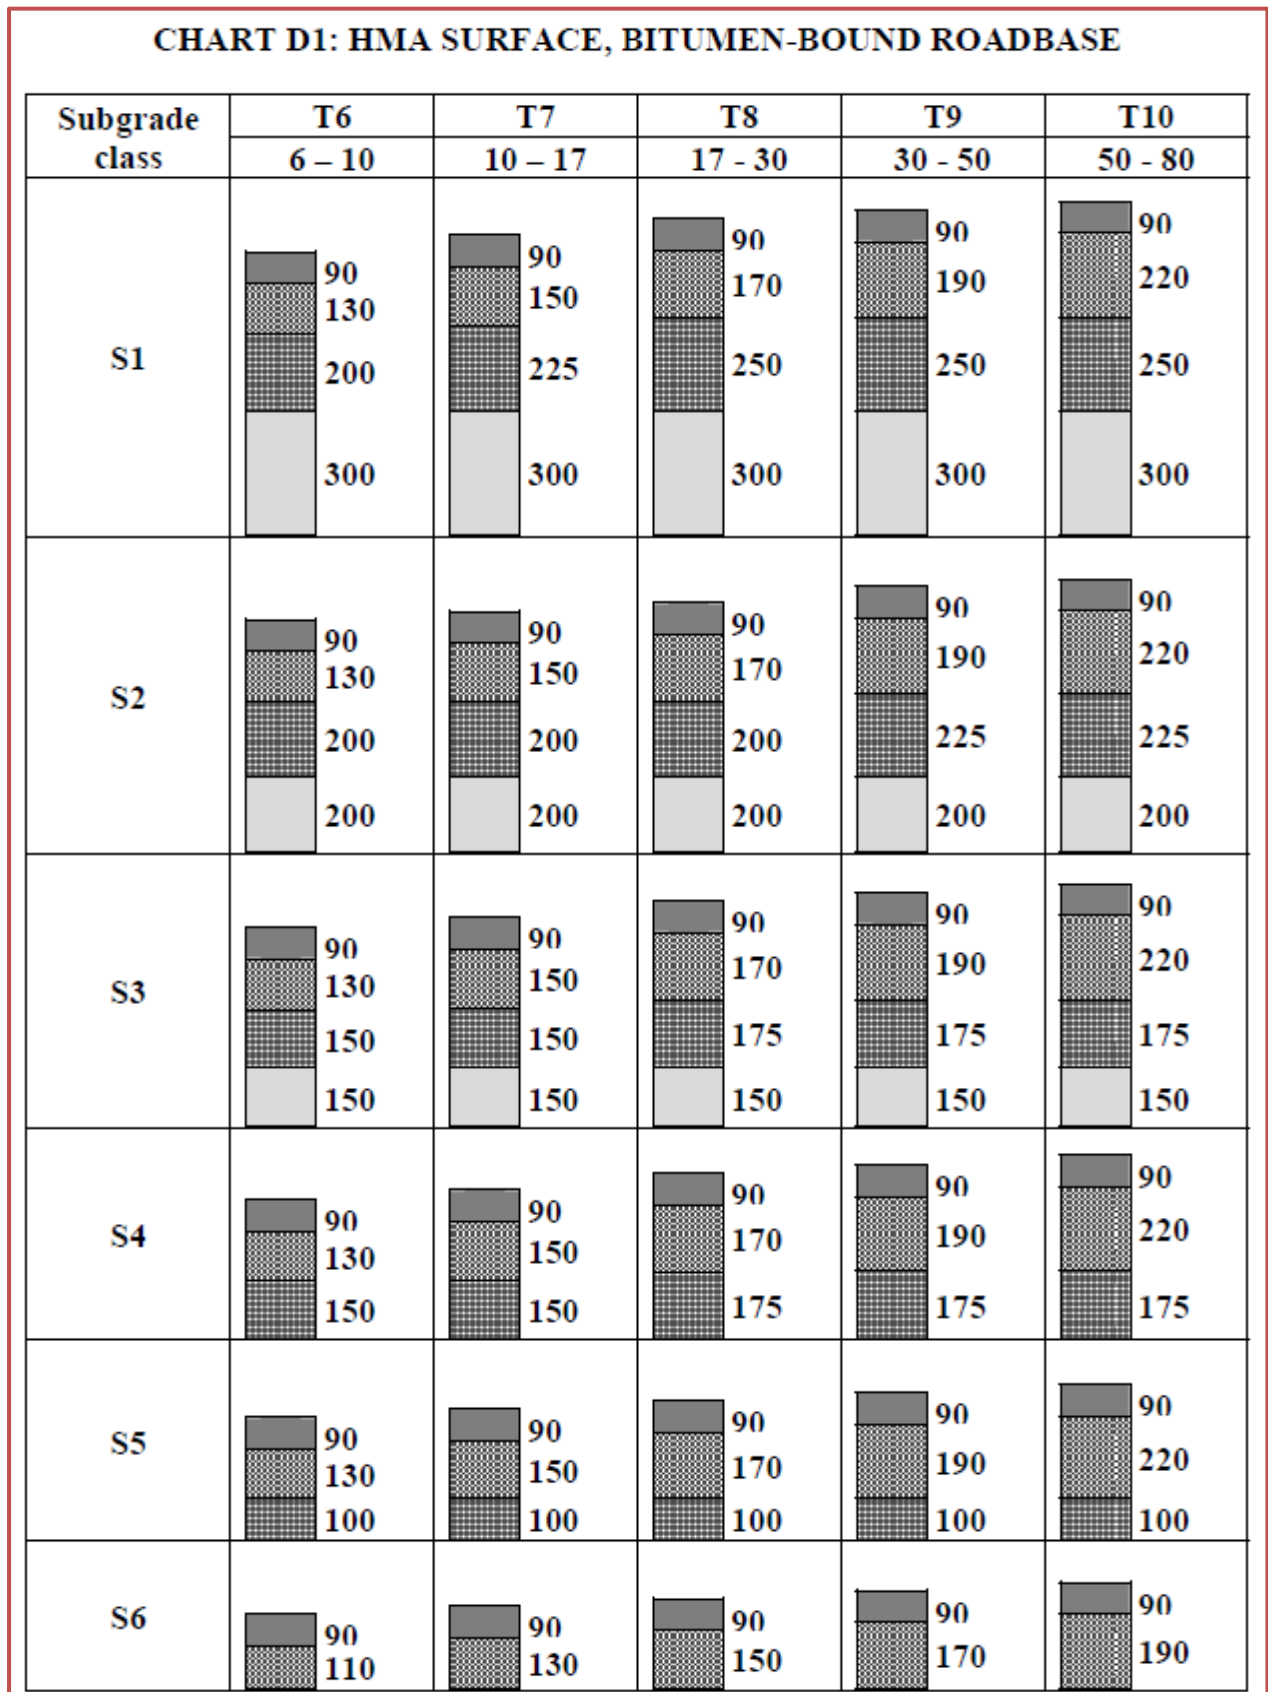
Design Thicknesses for Flexible Pavement (ERA PDM)
